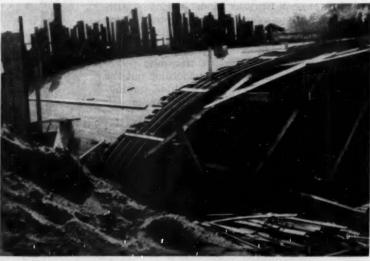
ARCH BRIDGE FALSEWORK requires detailed planning and construction to get necessary contours into forms and sufficient support for load to be carried. Planning also must include information on maximum rise of concrete in forms per hr.
